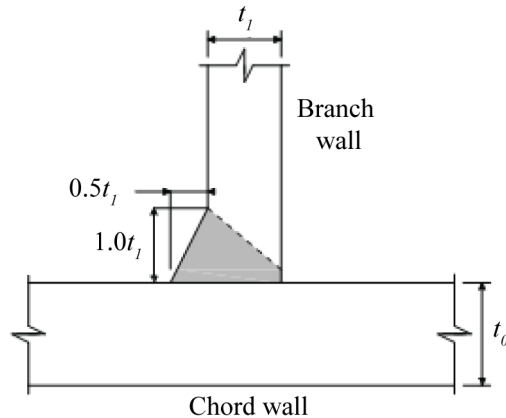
Weld dimensions (adapted from [27,28,30])
